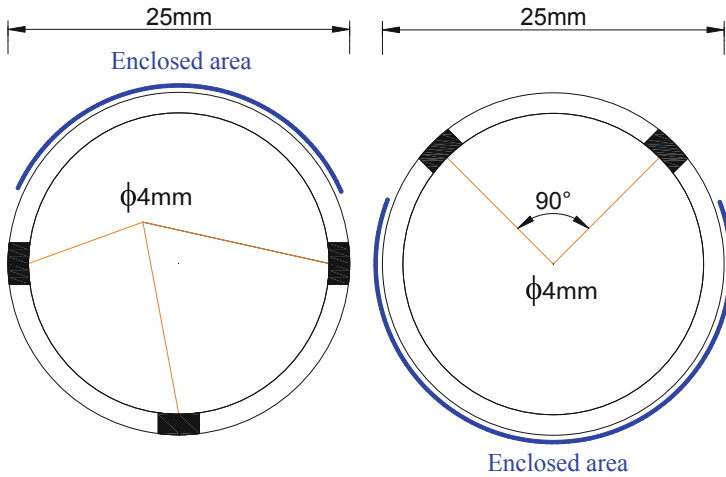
Schematic diagram of grouting pipe and exhaust pipe processing.
